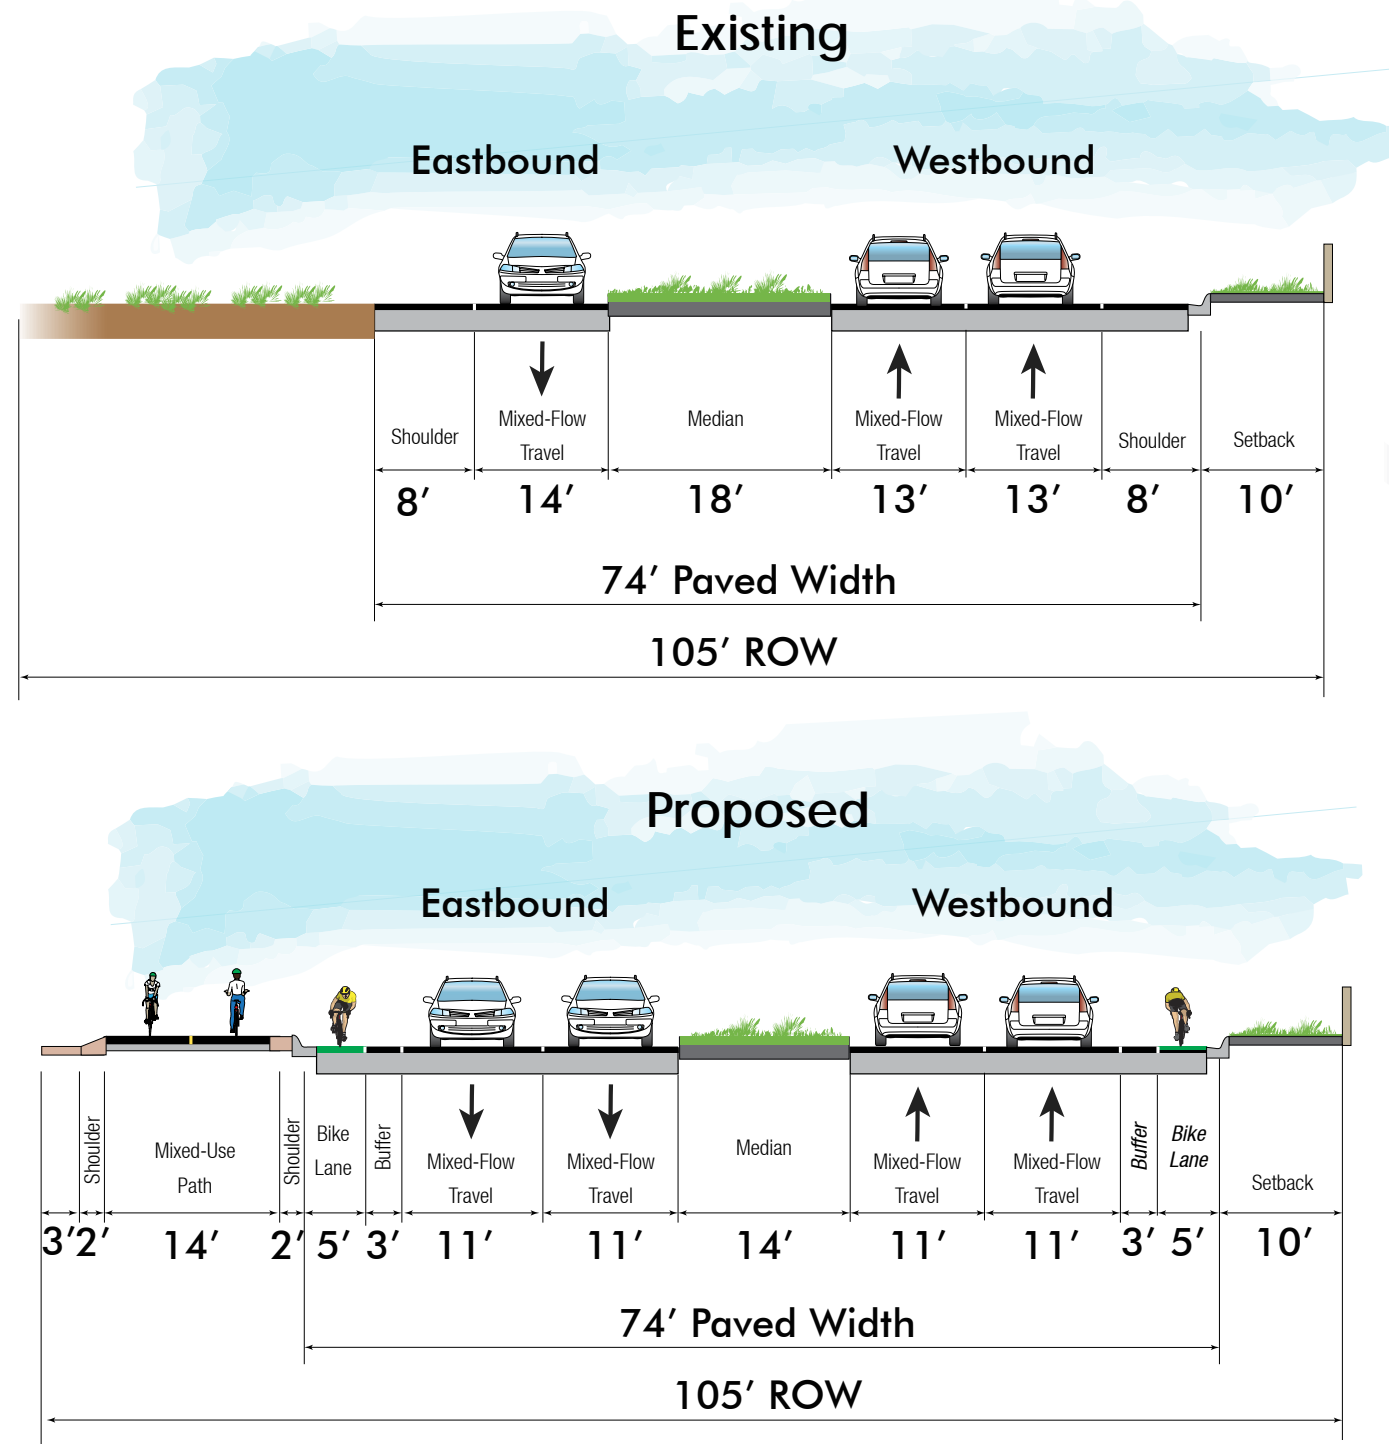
Typical Cross Section: Blanco Road (South Davis Road to West Alisal Street)
